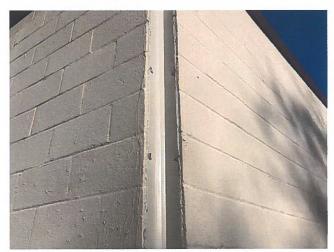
Corner detail in Auditorium wall with cover Photo 24. Base flashing detail along Auditorium wall plate added
